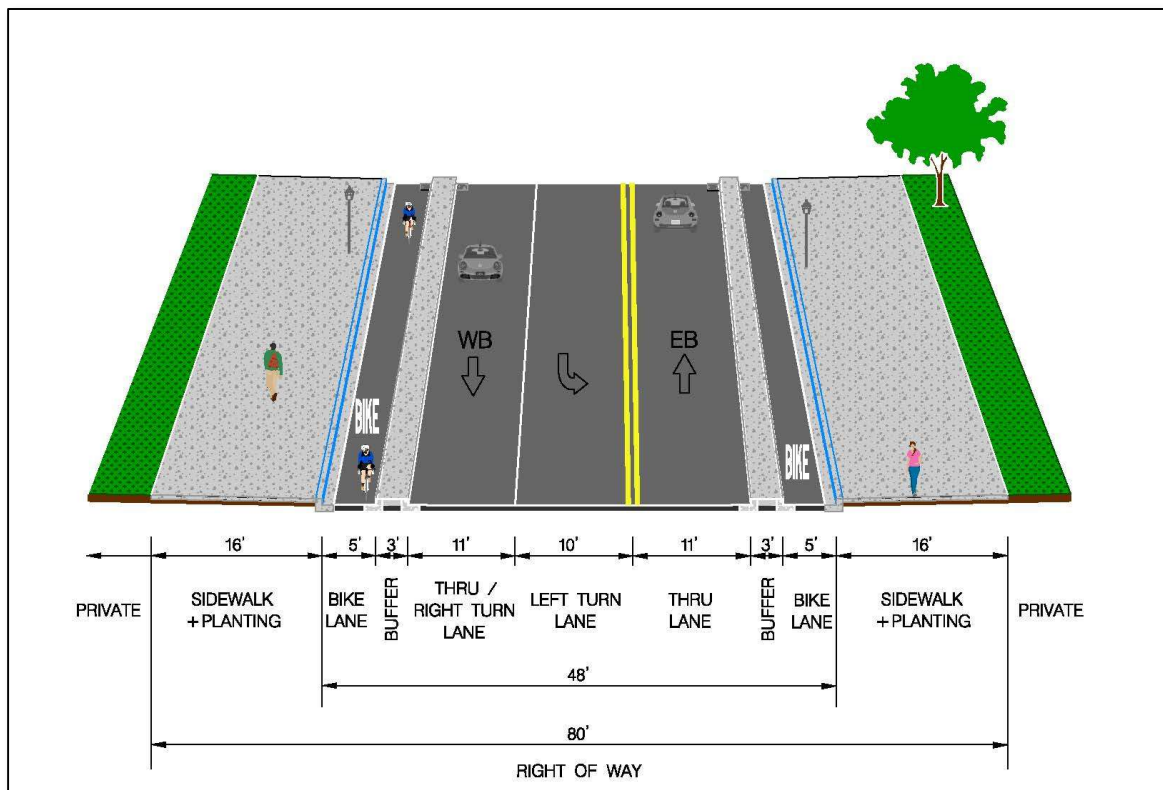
Cheltenham Drive Typical Section from Wisconsin Avenue to Tilbury Street
